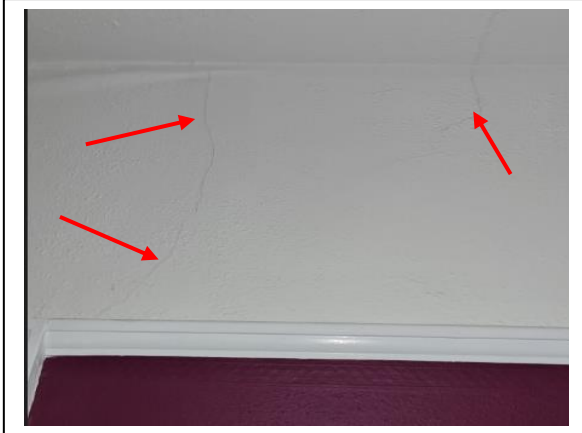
Flat 20 – Rear Right Bedroom - Cracking Above Door
